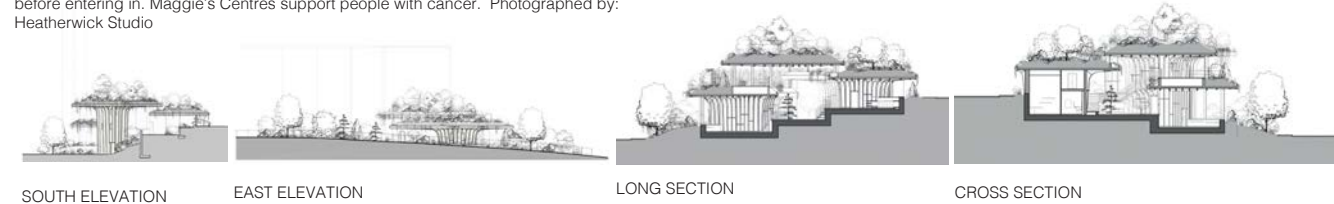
,27,28,29. Technical drawings of the elevations and sections. Photographed and drawn by: Heatherwick Studio
